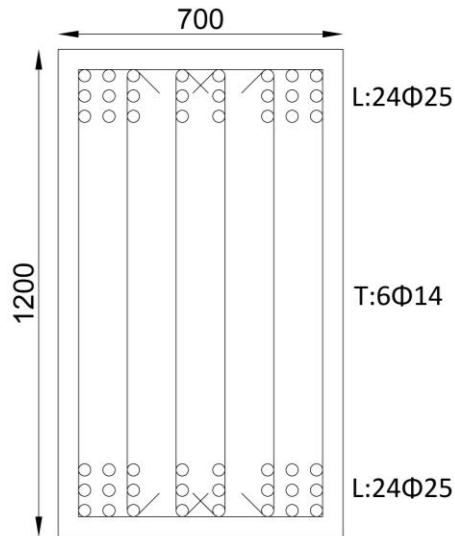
Coupling Beam Longitudinal Reinforcement
